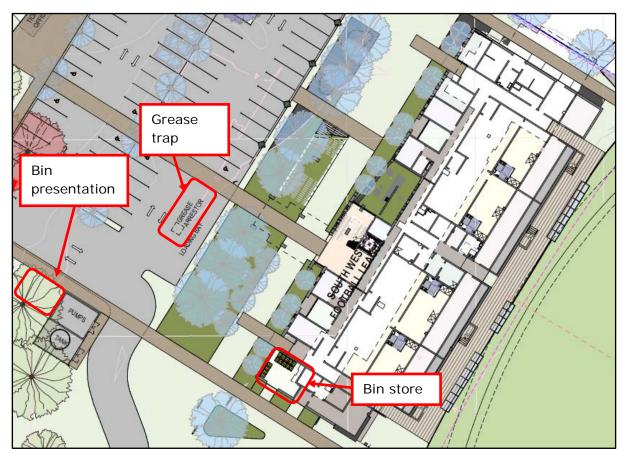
Site plan showing the location of the bin store, presentation point and grease trap
